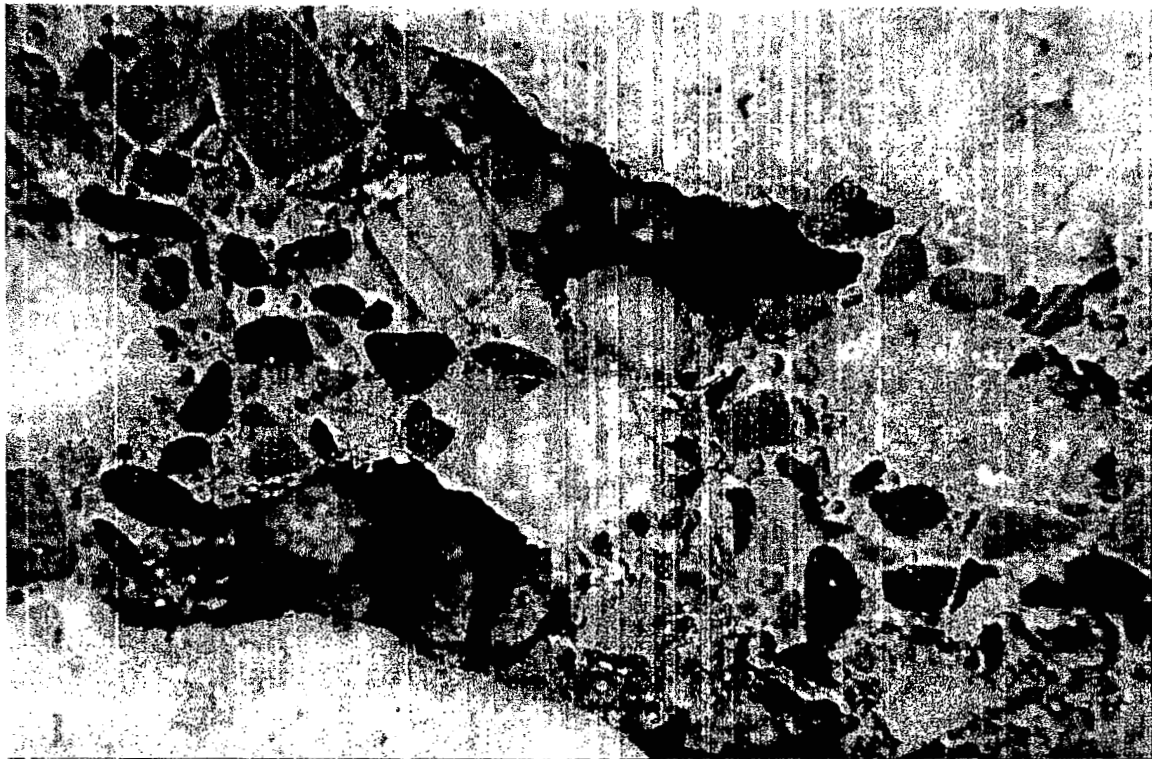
Section View (Perpendicular to the Wearing Surface) of Core PCC-4 (Test Section 390205)
